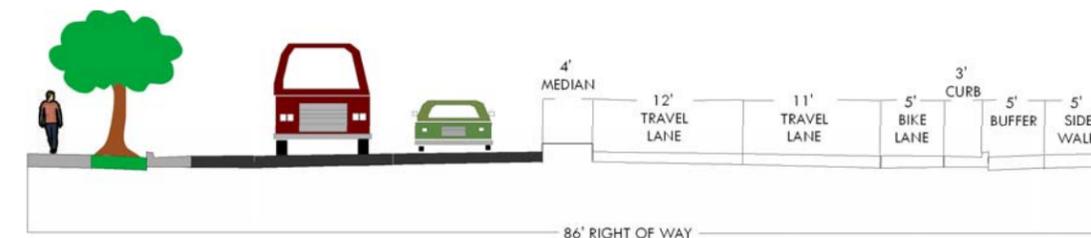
Example of typical street cross section with sidewalks and buffer
